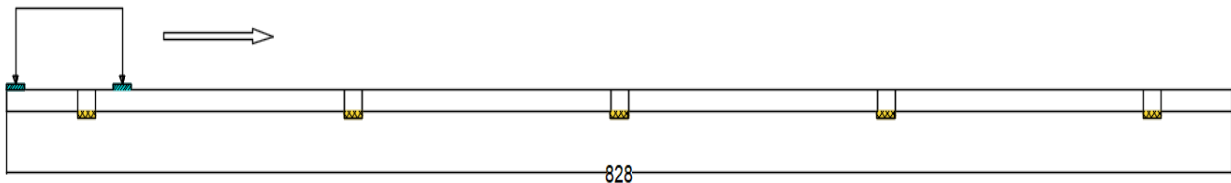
The placement of HL-93 load on the deck slab with 15 ft girder spacing (first combination)
